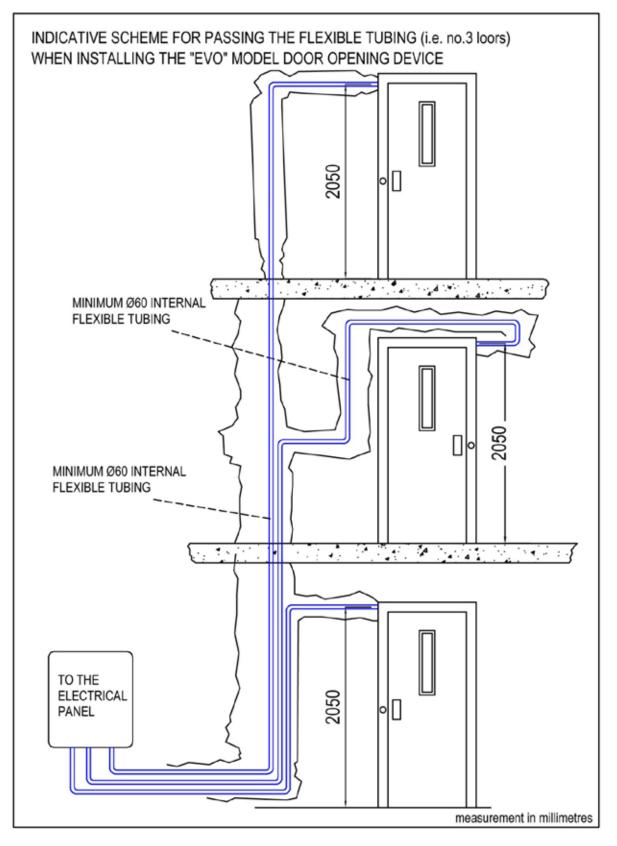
Passing the flexible tubing for the door's electrical fittings with the EVO door opening device
